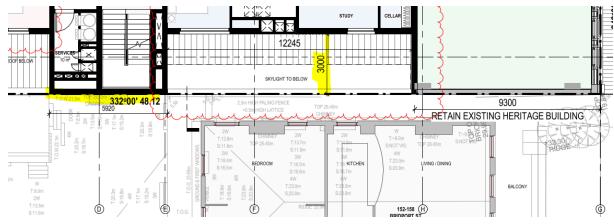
Screenshot of first floor wall on boundary in the proposed amended plans. Source: Source: TP.1101 Advertised plans, Cera Stribley.
